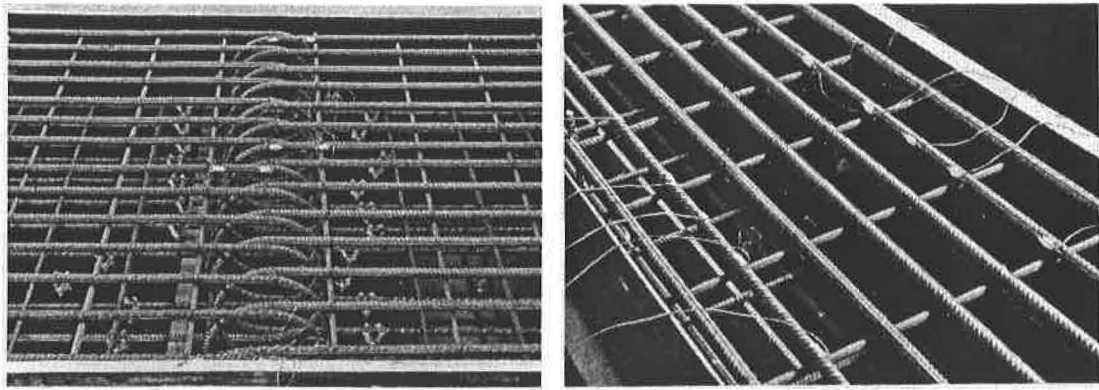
Reinforcement arrangement in specimen RV14 and RV15.
